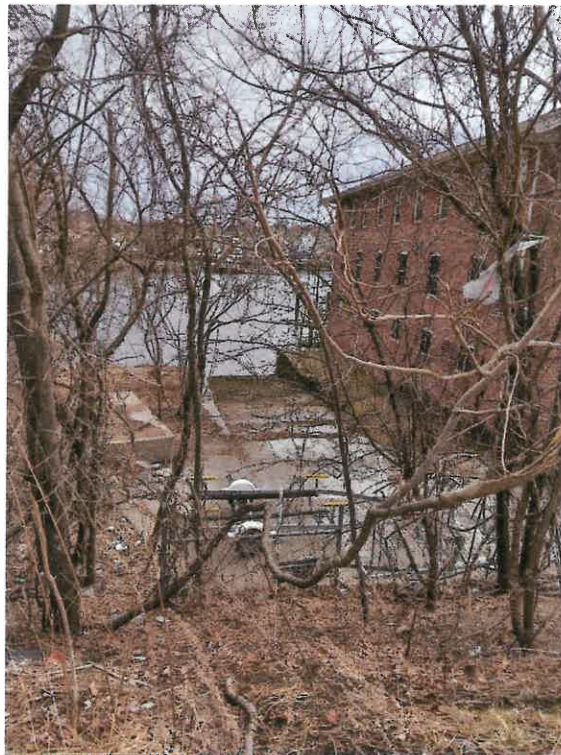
Coastal Feature #5 (Vertical stone wall) at southwest corner of bridge. See Figure 2.
